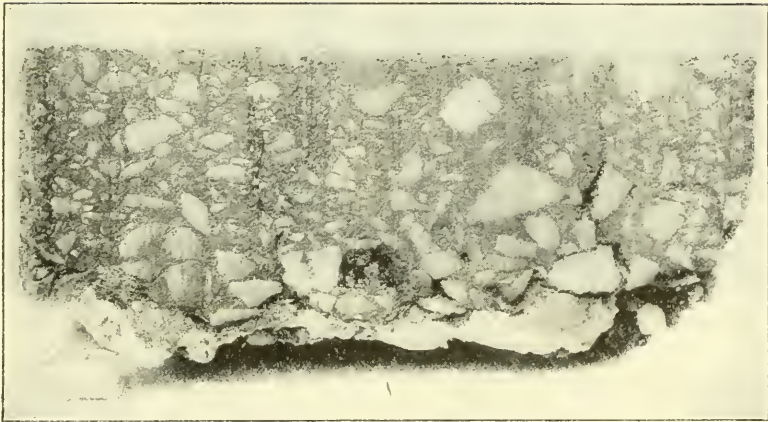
SEC. 4.—BITUMINOUS PAVEMENT, BUILT BY HAND-MIXING METHOD.
